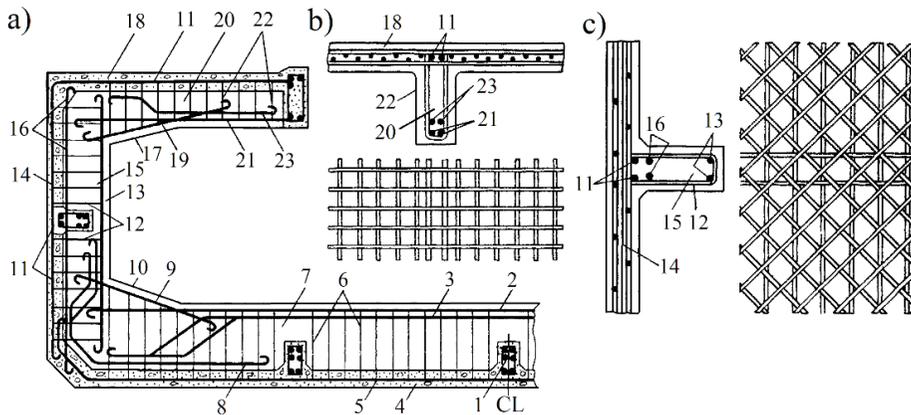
Structure of the Ferroconcrete Ship's Hull [Authors, 4]
